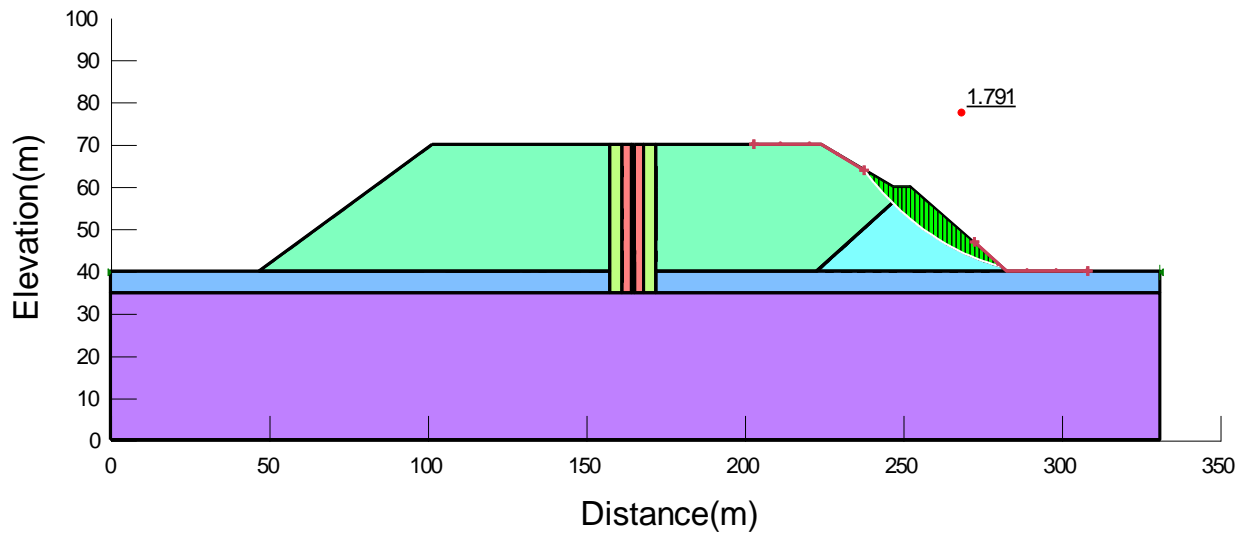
4: Slope stability during construction without Earthquake AC (D/S)
